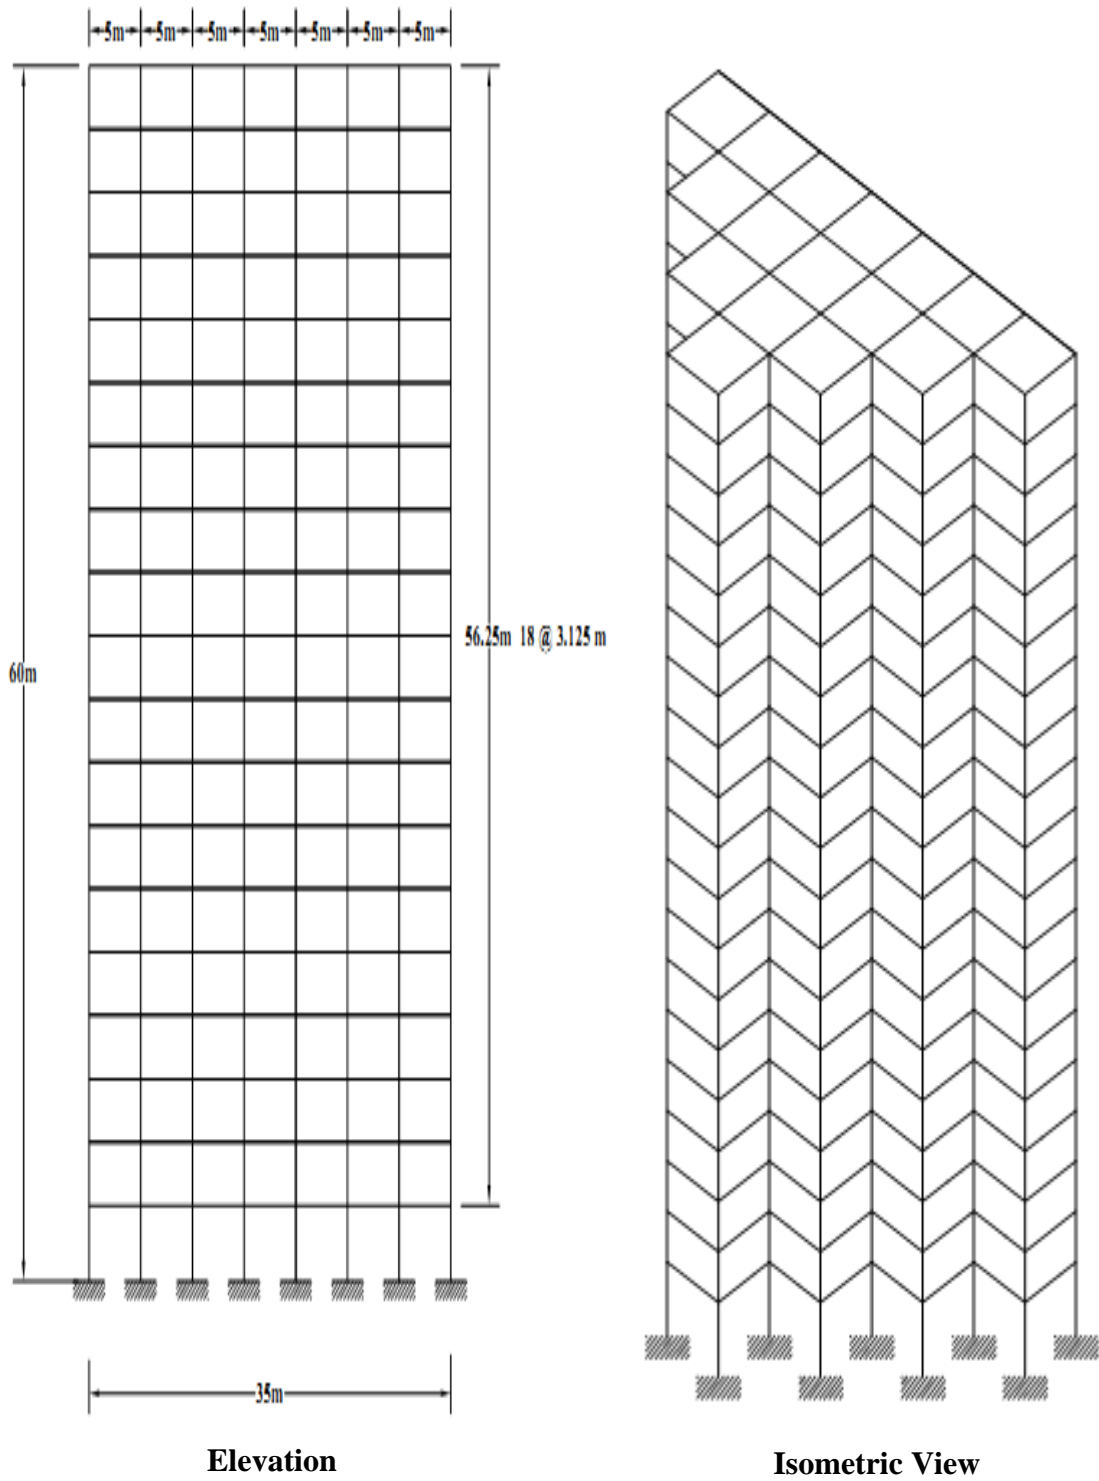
Elevation and isometric view of Plus Shape-1 building
